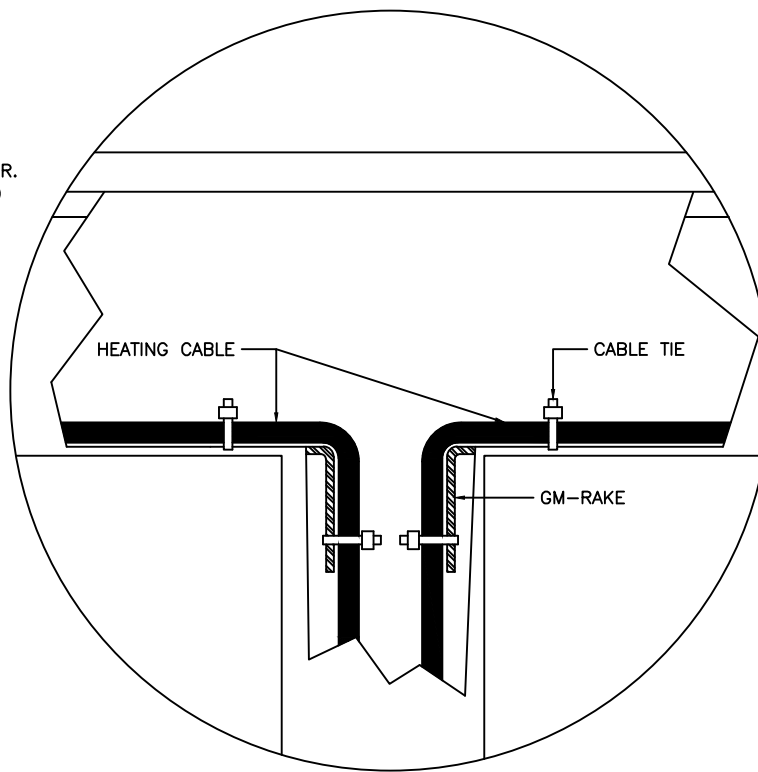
DETAIL A: CABLE INSTALLATION AND FASTENING ON ROOF, GUTTER AND DOWNSPOUT
